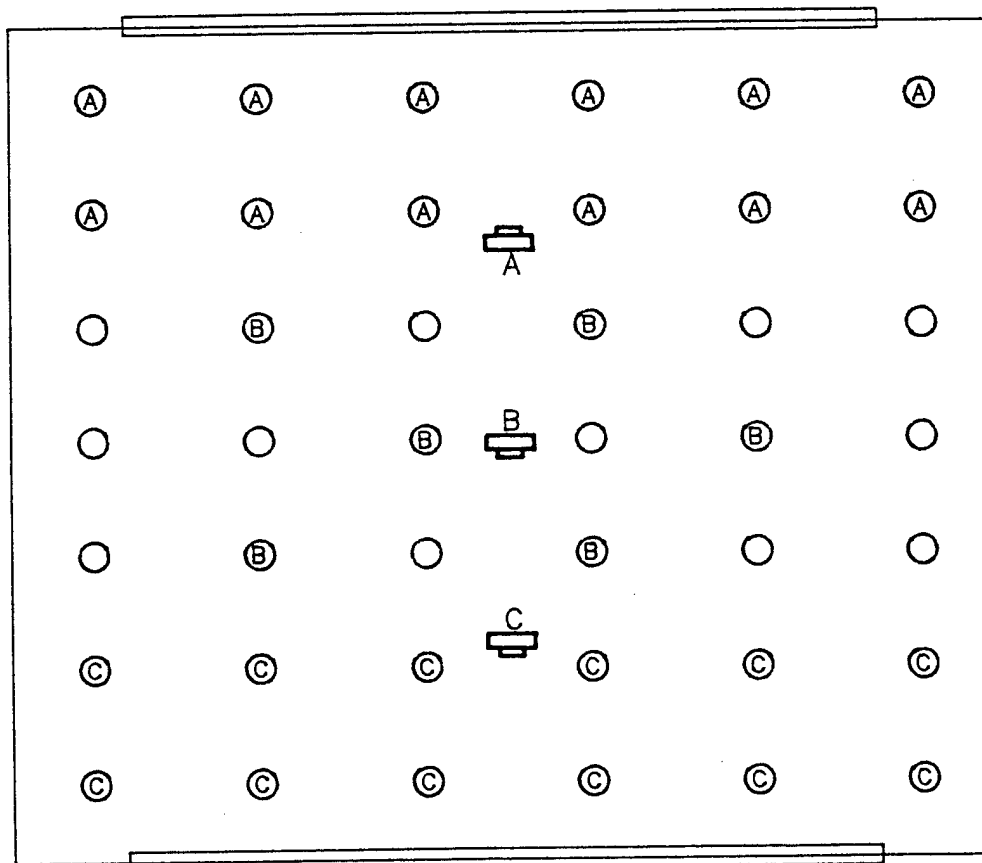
PHOTOCELL CONTROL LAYOUT - BUILDING 5253
